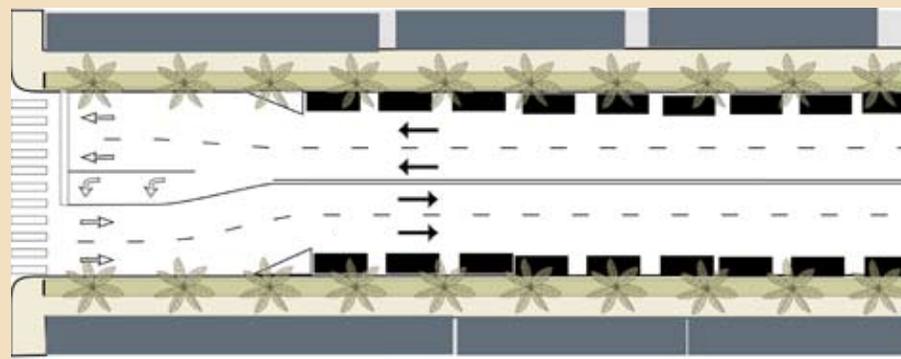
Final Transition to Town Center; On-Street Parking; No Median; No Driveways
